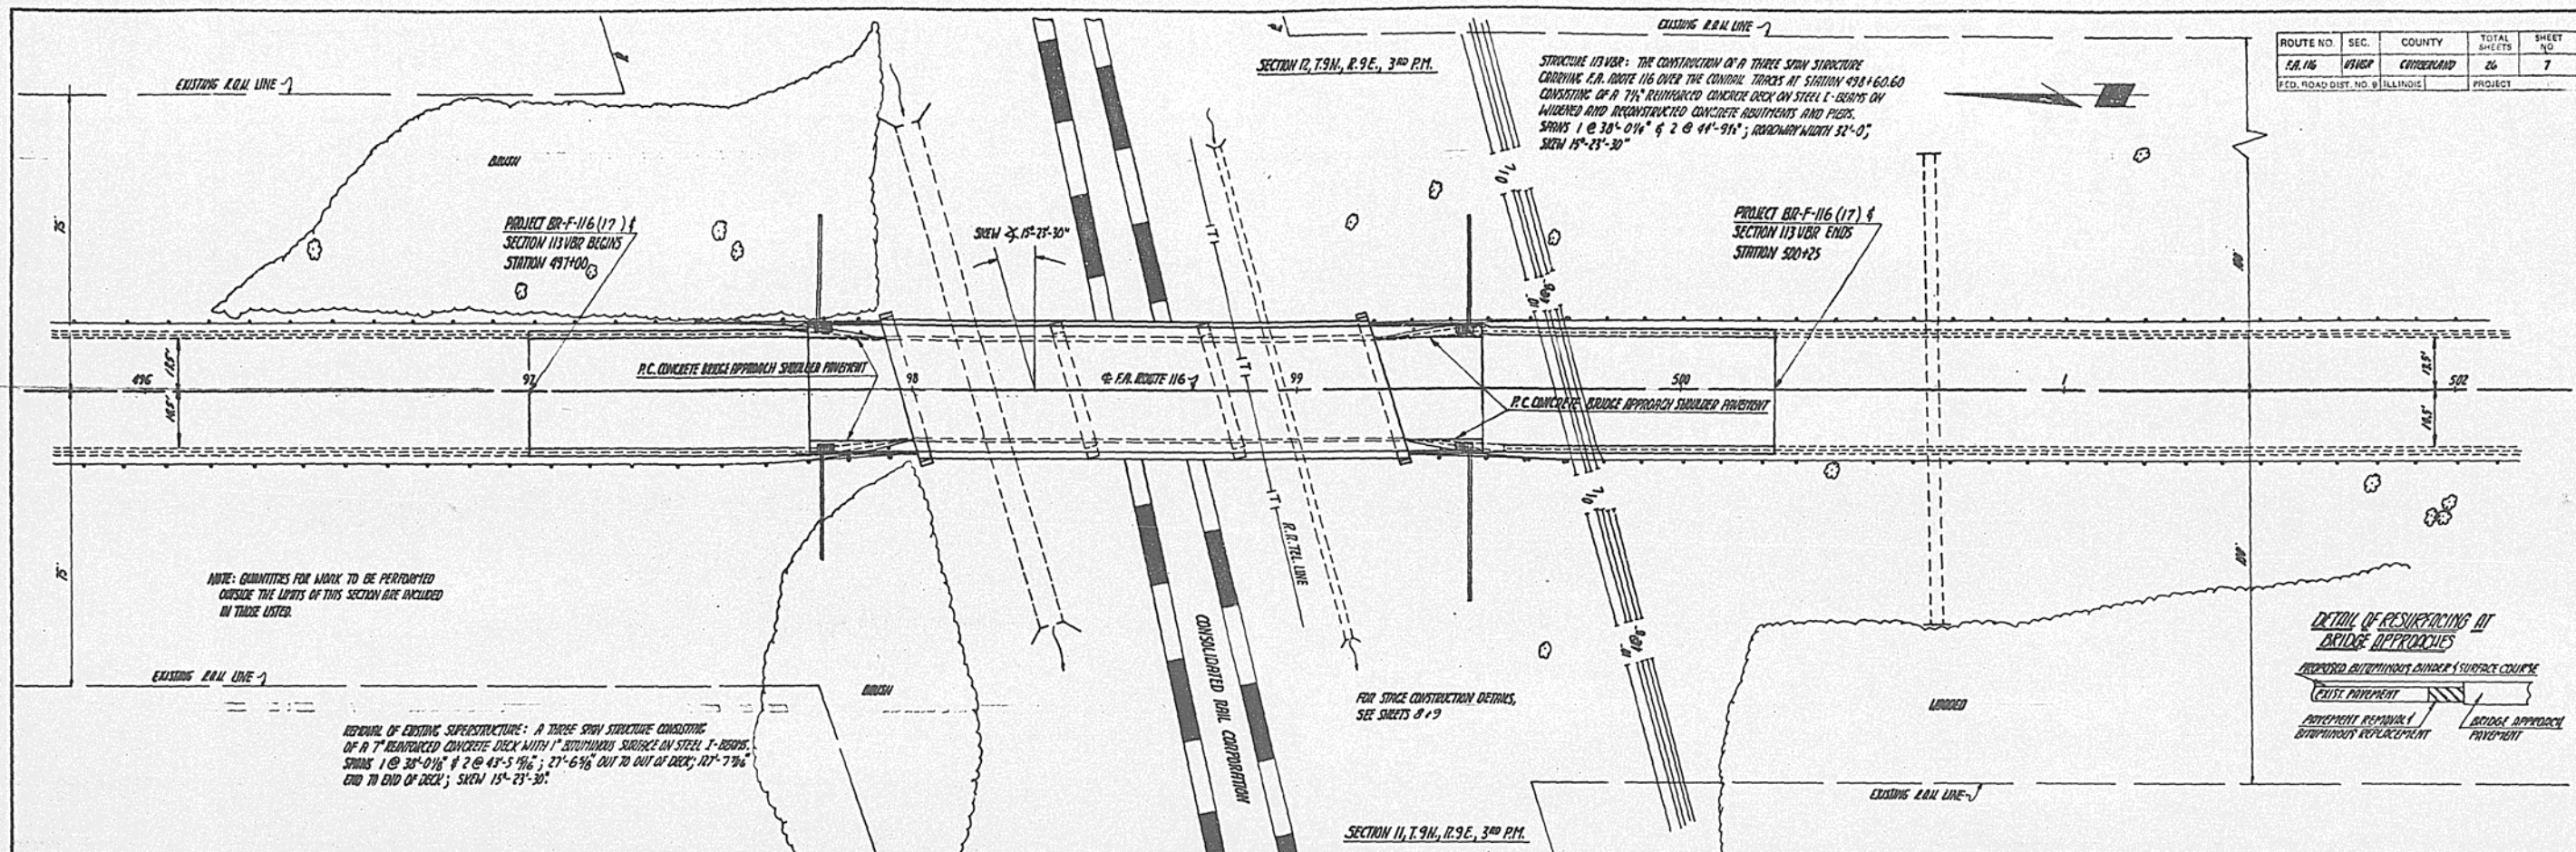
PLAN-PROFILE B.P.R. STANDARD
